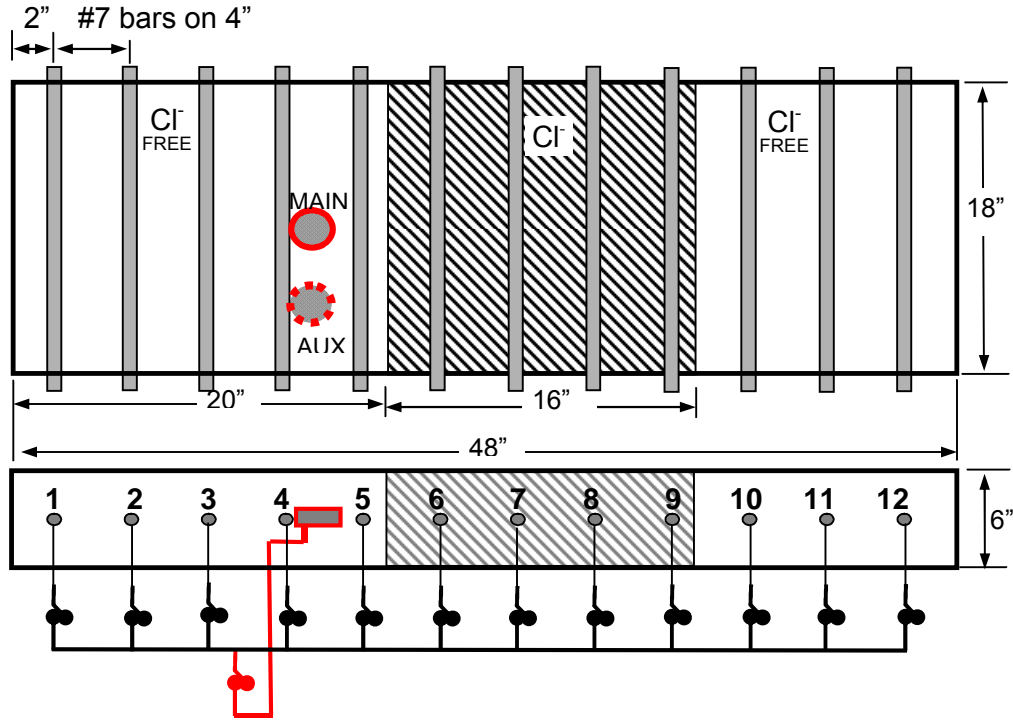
Test Slab Configuration. Plan and elevation view. 1" = 2.54 cm
